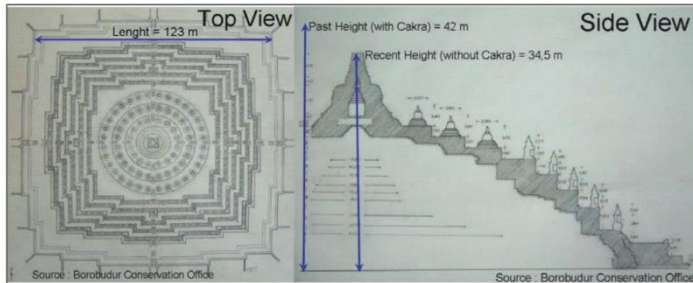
Plan view (left) and side elevation (right) of Borobudur (courtesy: Borobudur Conservation Office).
